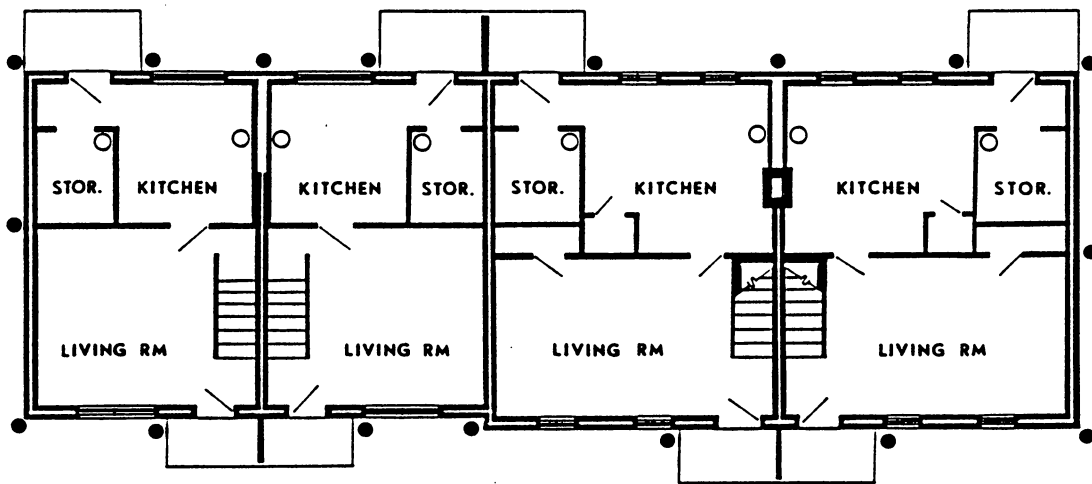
First-floor plan, dimensions 42.4 by 8.2 m, depicting placement of traps for oriental cockroaches
